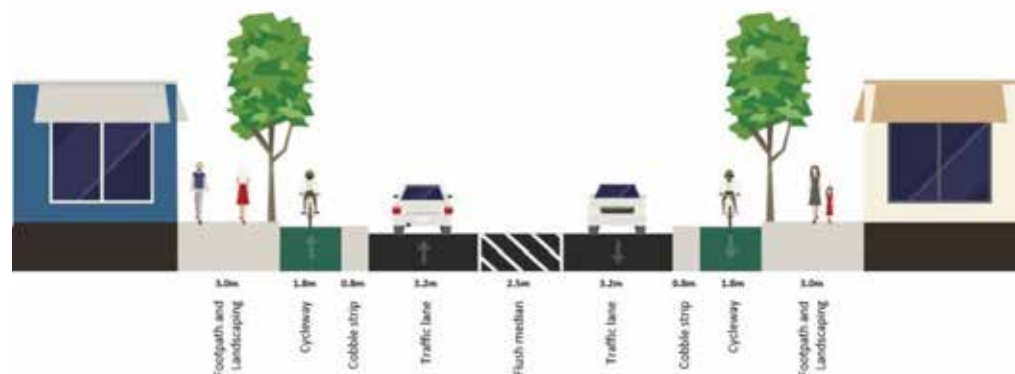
Retail Core (East) Precinct - Cross section of Gerald Street
